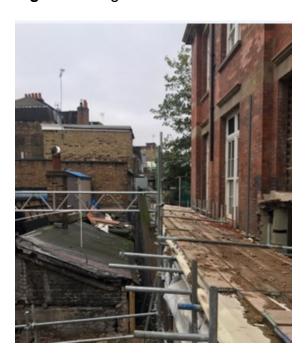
Site viewed from the north looking onto the flat roof of the King's Head
